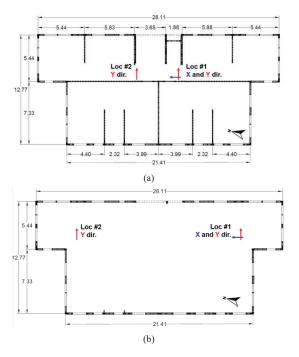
Sensor layout with the location and direction of the accelerometers. (a) Typical floor level, and (b) Roof level.
